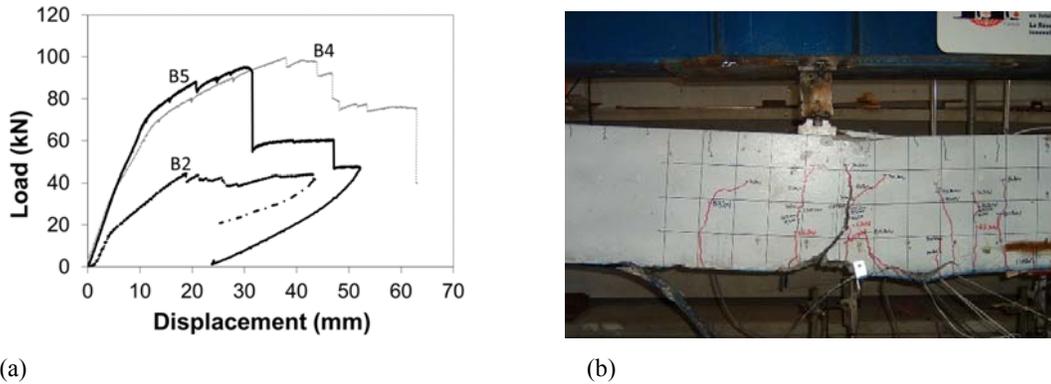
Static loading to failure (a) Load-deflection (b) Failure mode of Beam B5 (Photo: J. Ford).
